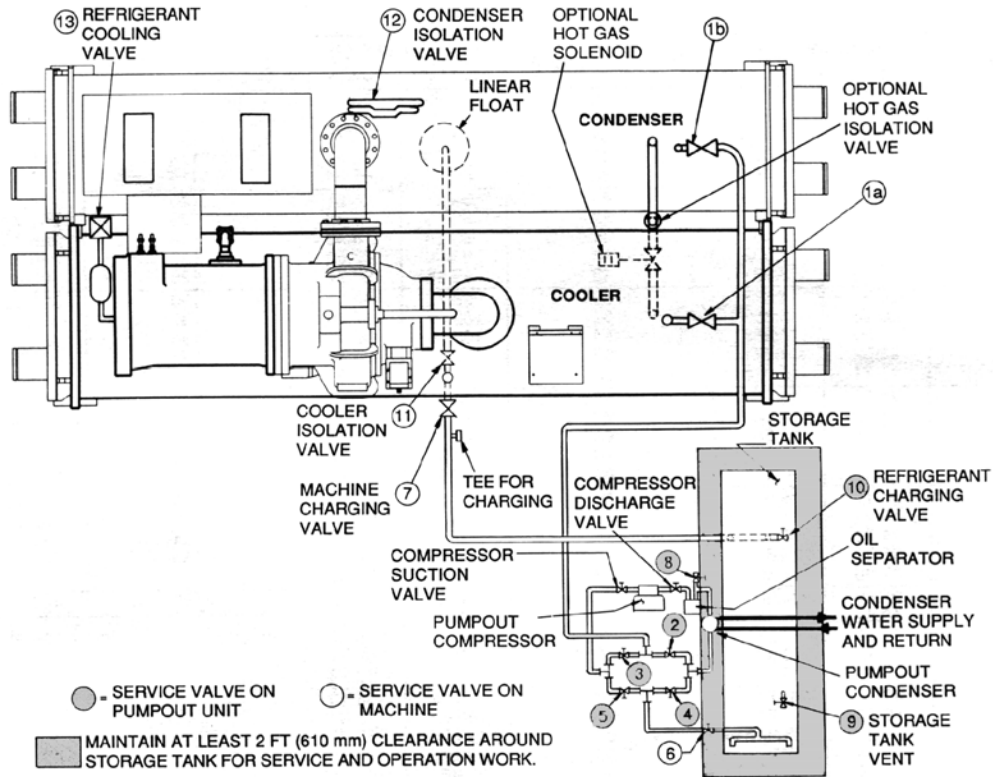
Typical Optional Pumpout System Piping Schematic with Storage Tank
